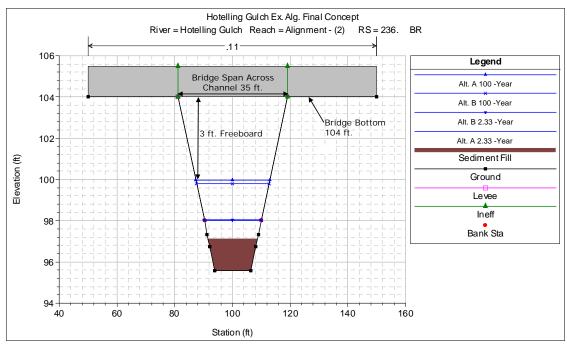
HEC-RAS representation of the proposed channel cross section and bridge crossing at the Cecilville Road crossing of Hotelling Gulch.
